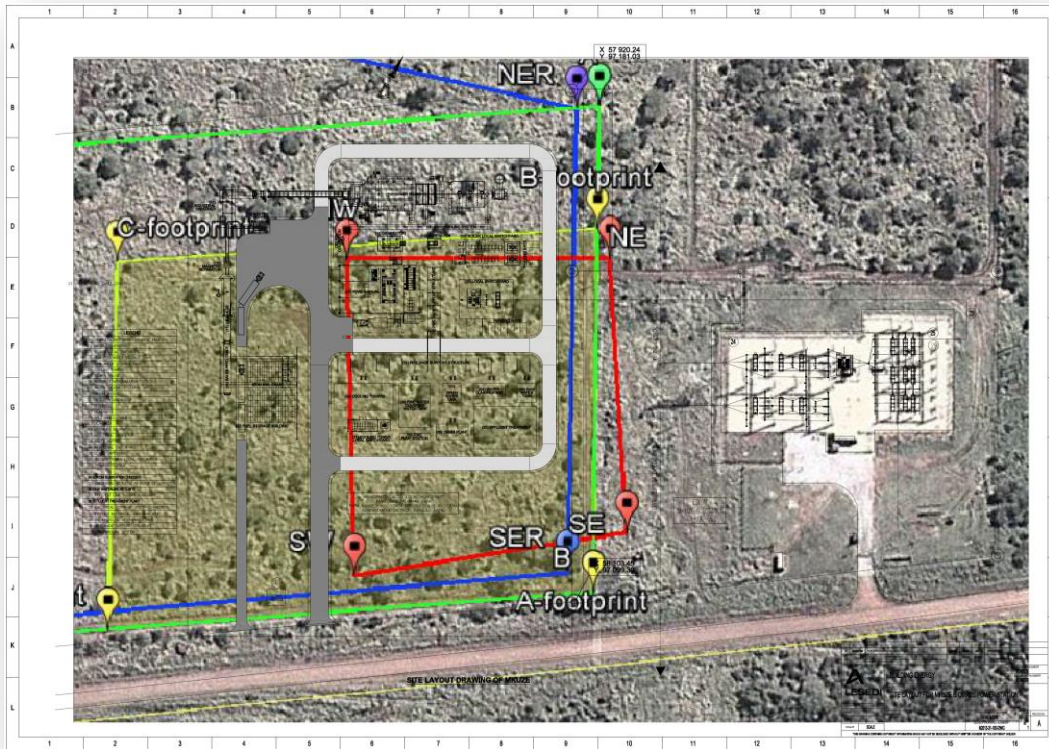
New proposed foot layout (red line the original Alternative 2 foot print)
